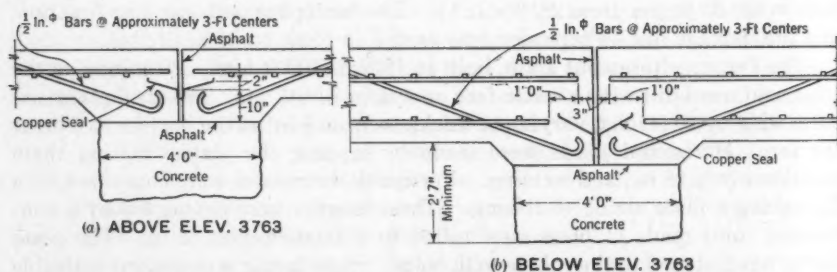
VERTICAL EXPANSION JOINTS, SALT SPRINGS DAM
